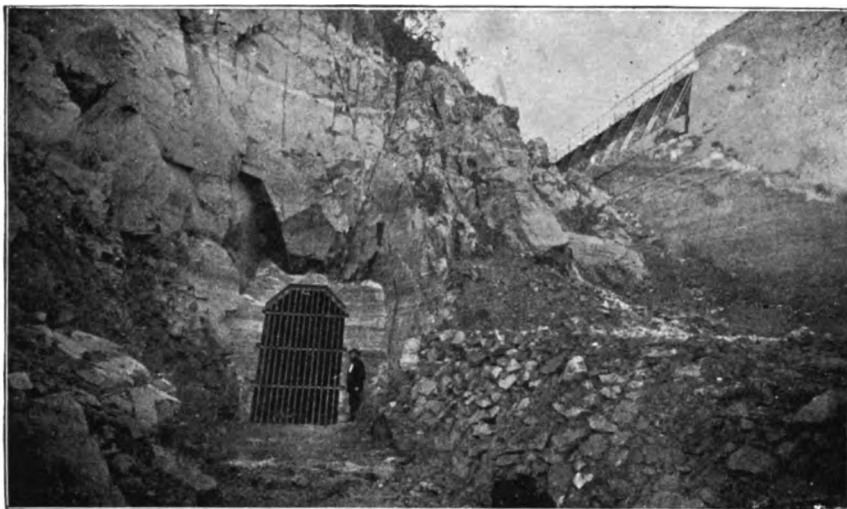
SWEETWATER DAM, SHOWING HEAD OF OUTLET TUNNEL AND SPILLWAY.
